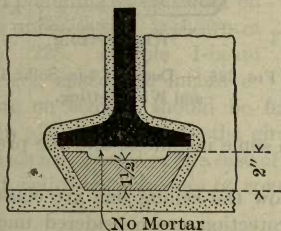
Detail of 2-in. Soffit Tile Beam Protection.
